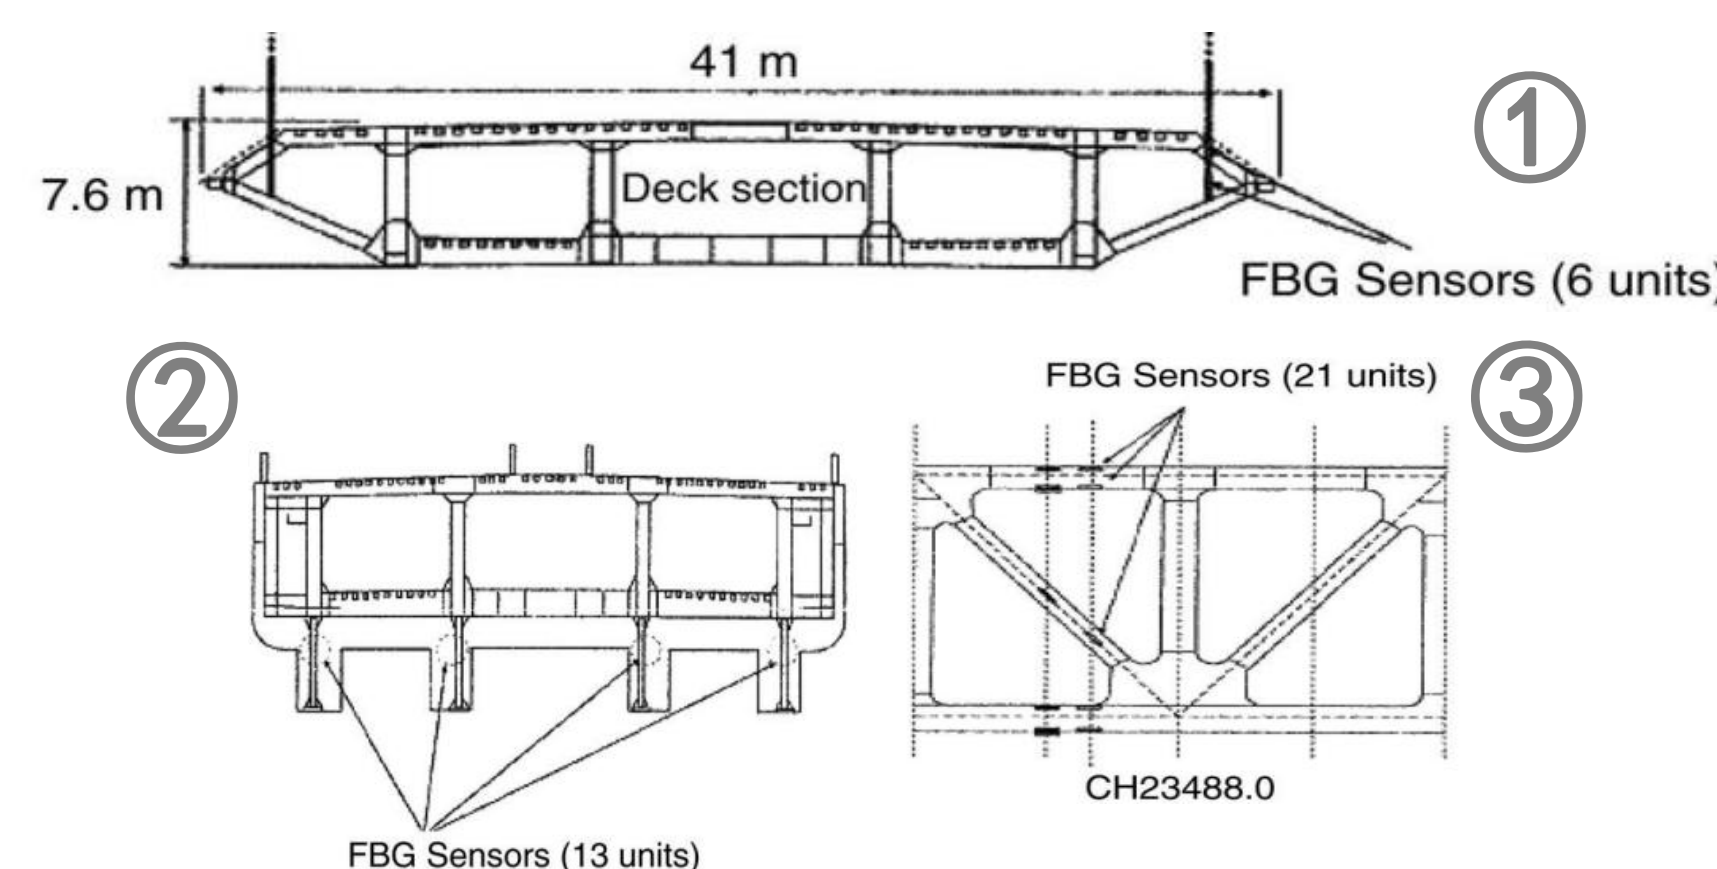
40 FBGs were installed on the TMB to measure temperature and strain at (1) hanger cable, (2) rocker bearing, and (3) truss girders of section Chainage.
